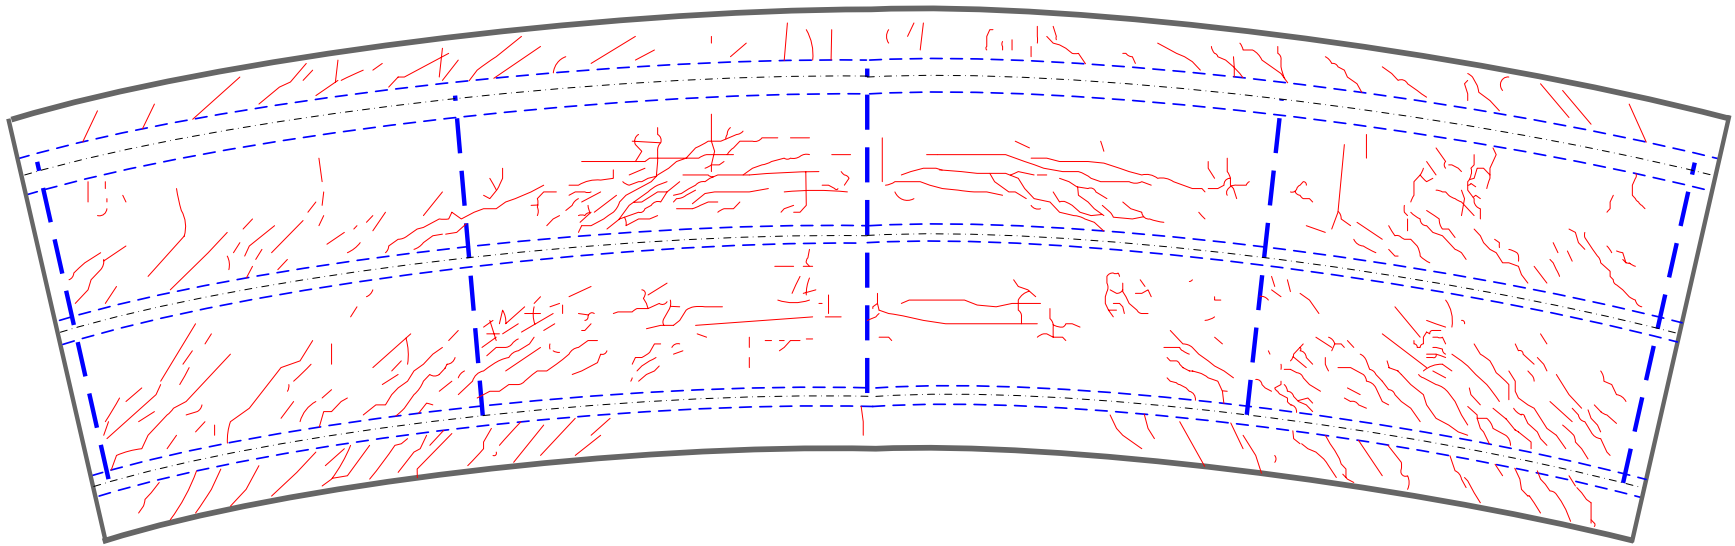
Plan view of the composite test bridge with crack patterns observed on the bottom surface of the slab at the end of ultimate loading test, courtesy of FHWA.
